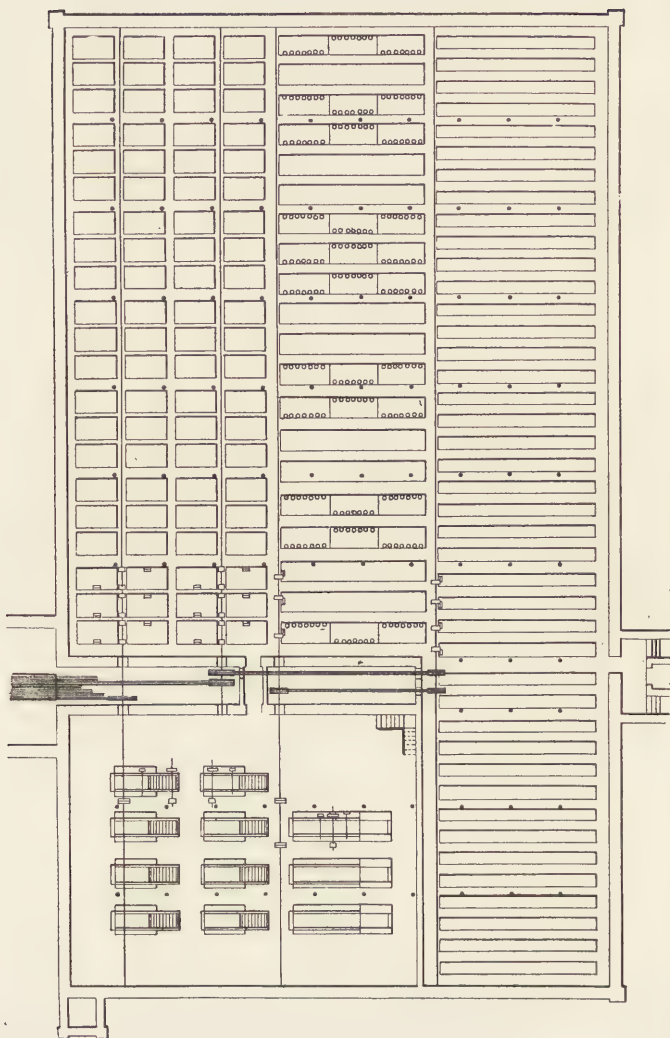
PLAN OF MILL FOR SPINNING AMERICAN COTTON. (Ground Floor.)
